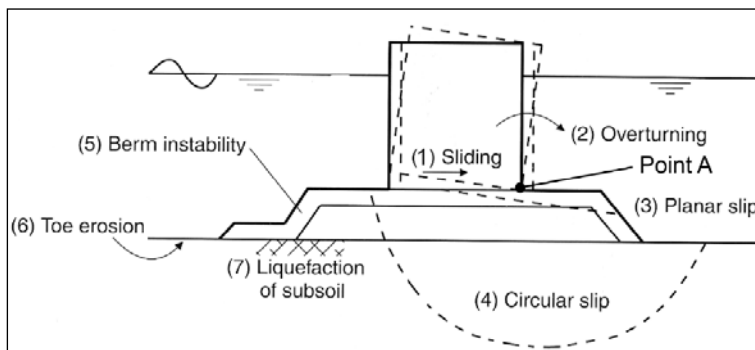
Failure mechanisms of a caisson before embankment [1].
